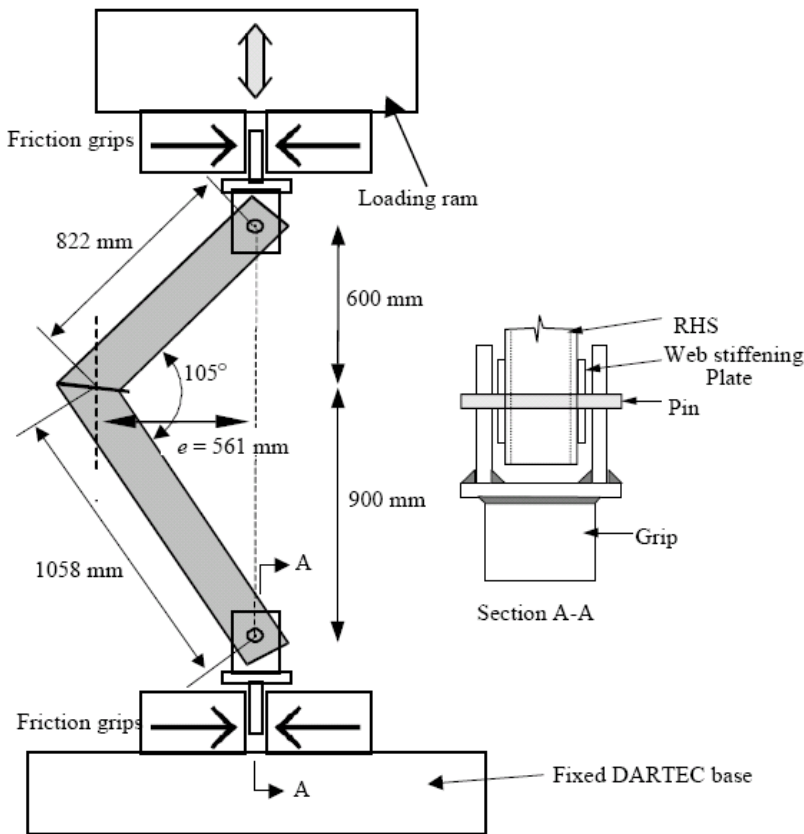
Schematic details for knee joint test (Wilkinson, 2000)
